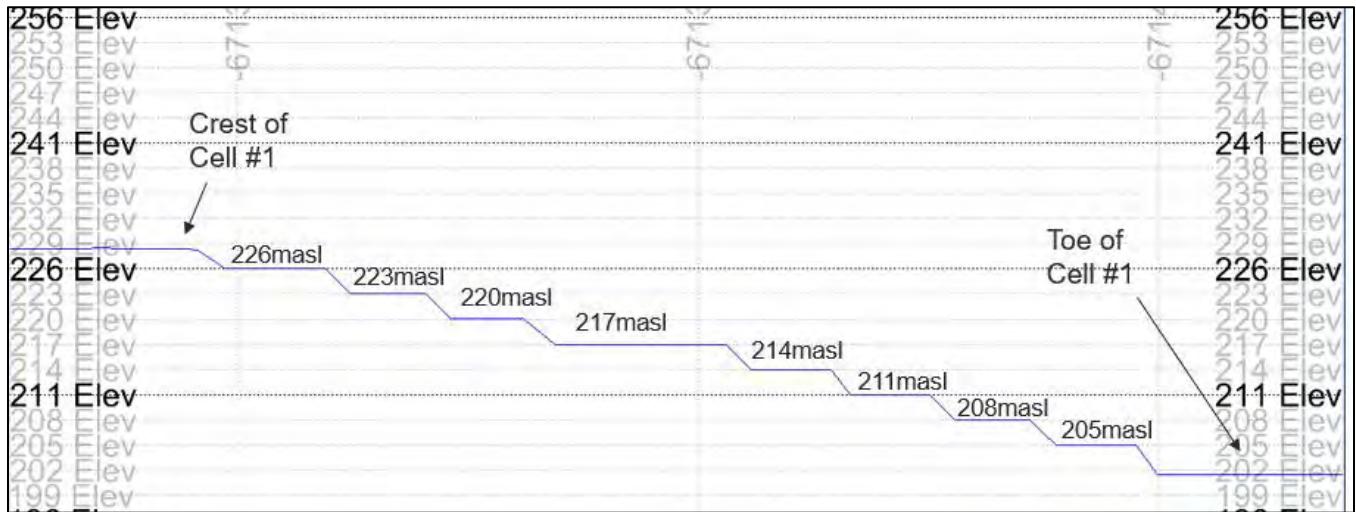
End of Year 10 – Section View of Benches, Looking North
